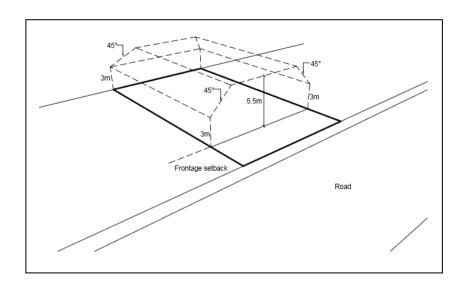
Building envelope as required by clause CCO-S5.7.1-A1 and A2 that is in substitution for General Residential Zone – clause 8.4.2-A3 and clause 8.5.1-A2
